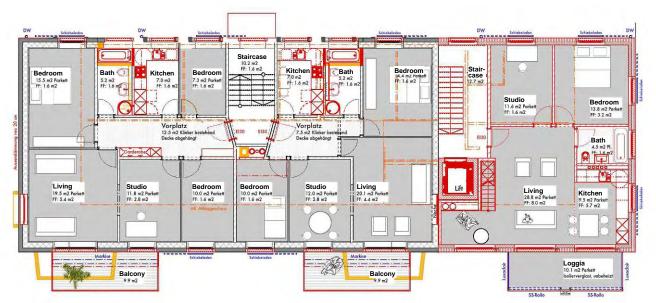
Typical floor plan of building with planned floor plan changes and new building annex (in red)
